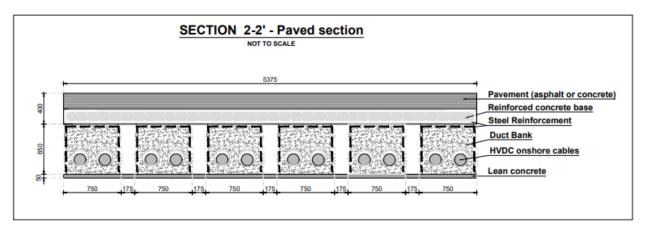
Section View of Buried Onshore Section with Road Surface.
